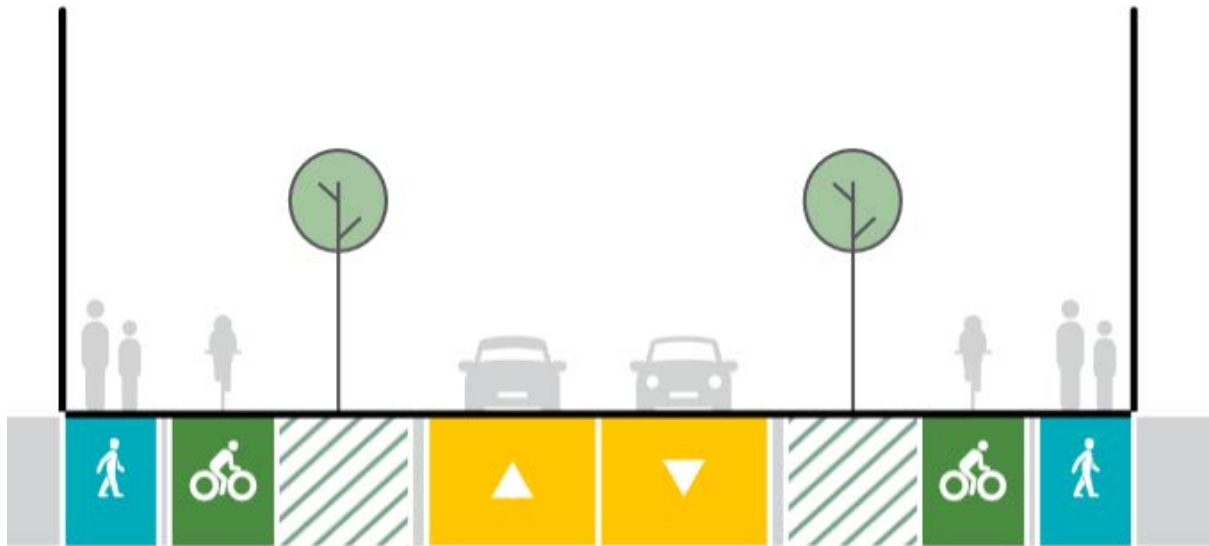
Indicative 20m Road Corridor Cross Section – Meryl Avenue
